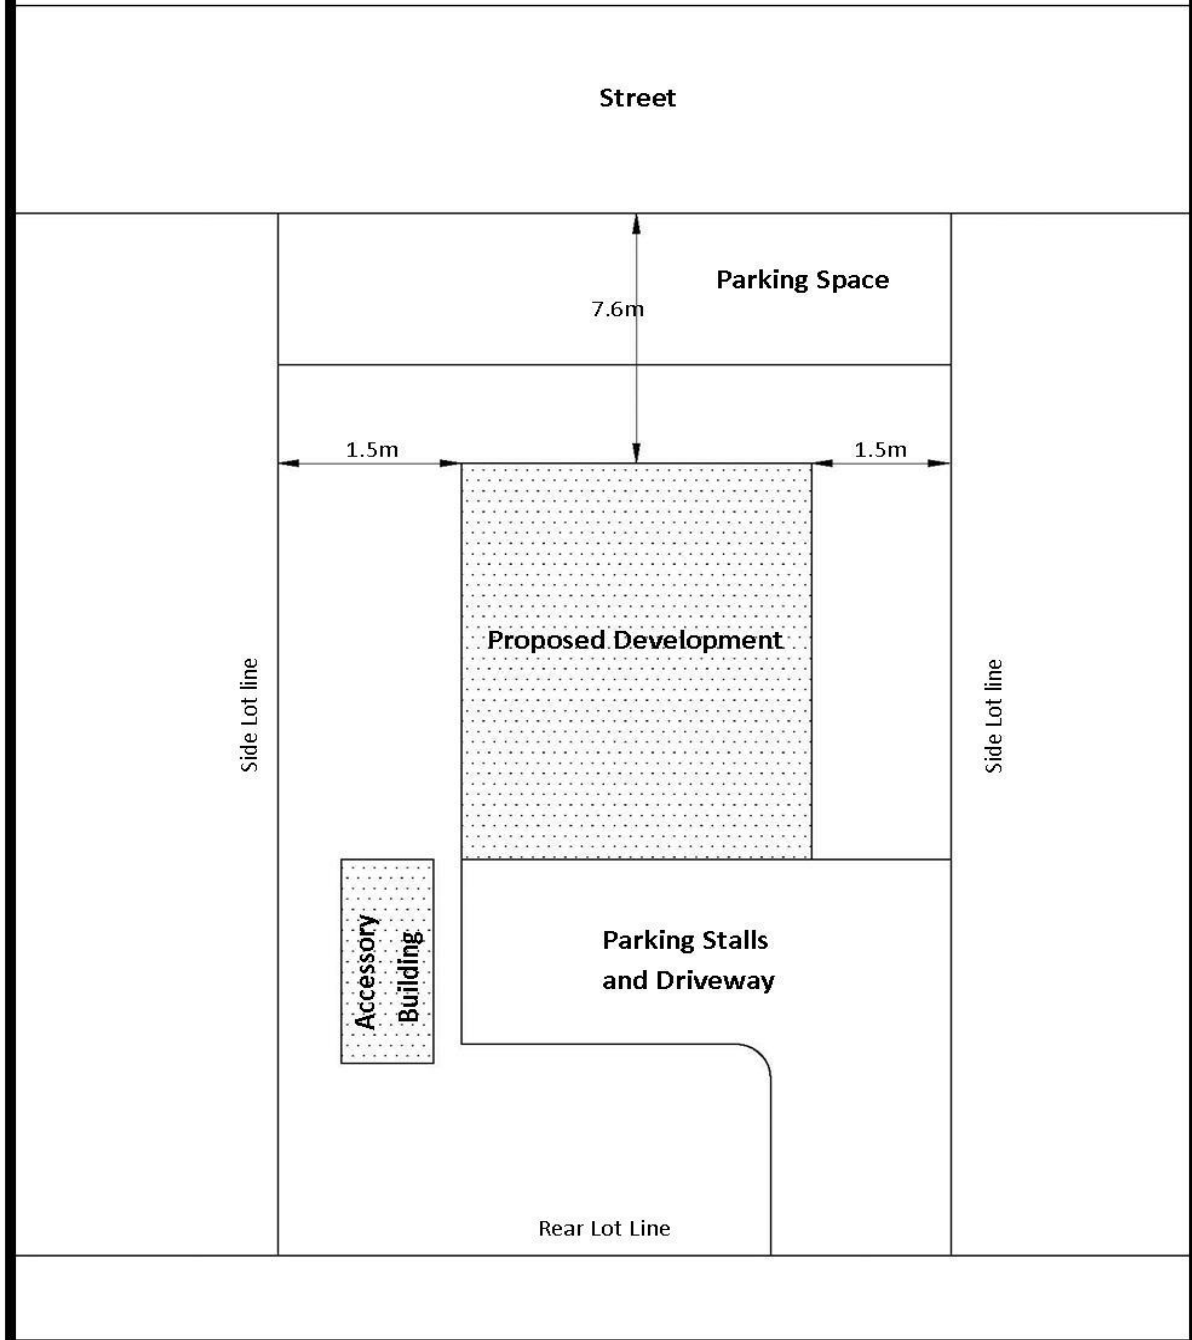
A Typical Site Plan for Non-Rural Development Permit Applications
